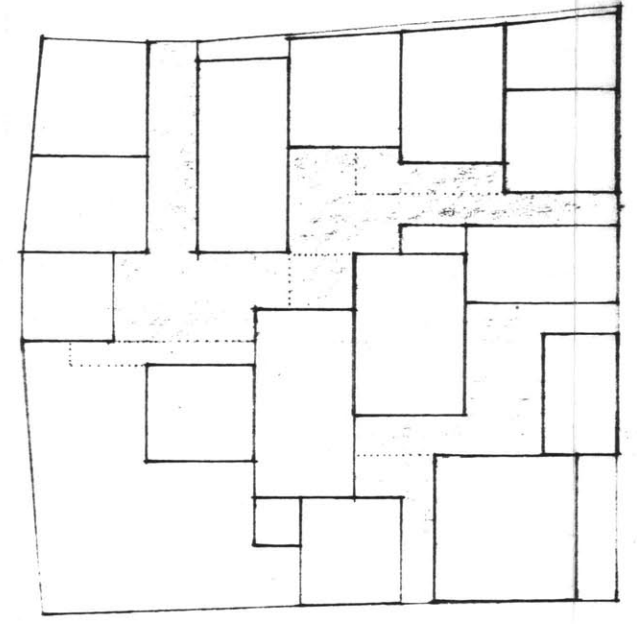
'3A'. Site plan. Access study. Opening of cul de sac in '3'.
